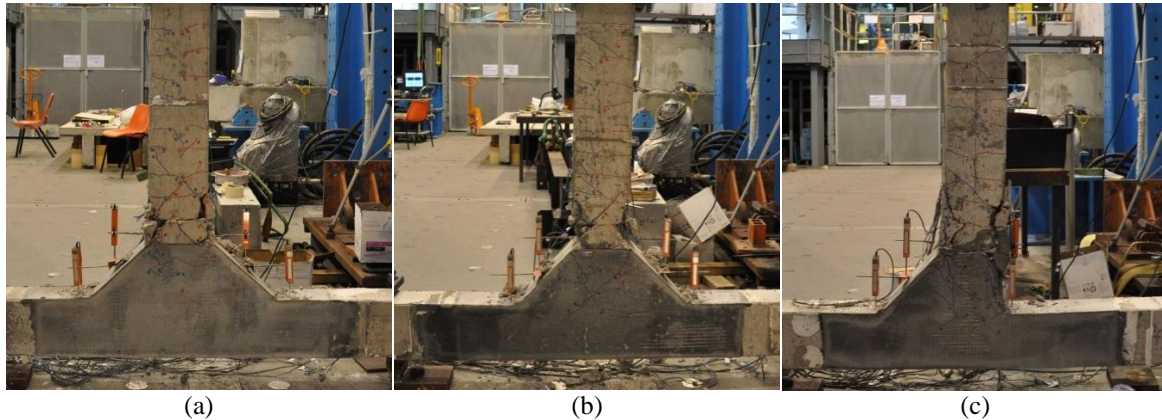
Failure modes of strengthened specimens: (a) JS1, (b) JS2 and (c) JS3
